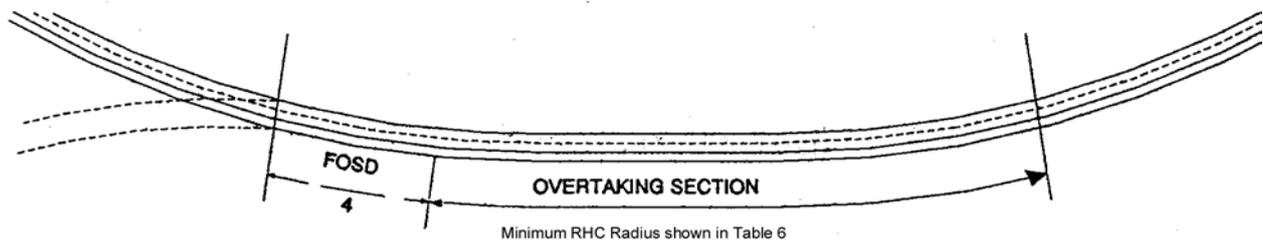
Downhill Overtaking Sections at Climbing Lanes
